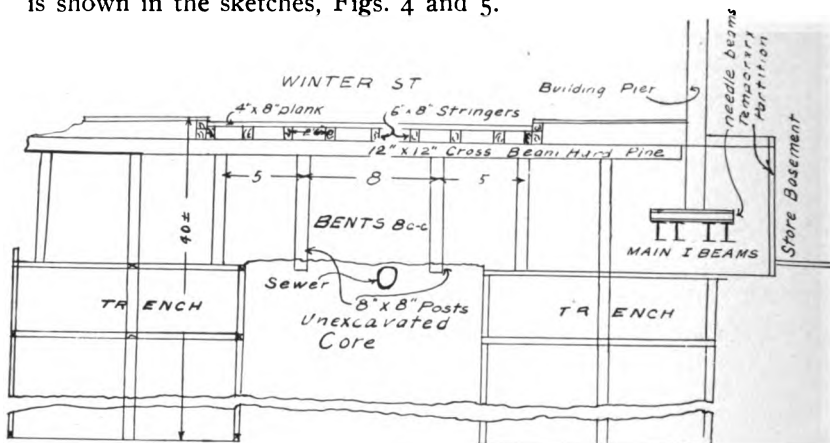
Underpinning Construction, Section A, Dorchester Tunnel
